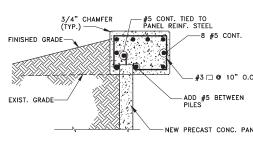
DETAIL: NON-TYPICAL PRECAST CONCRETE PANEL SCALE: 3/8" = 1'-0
